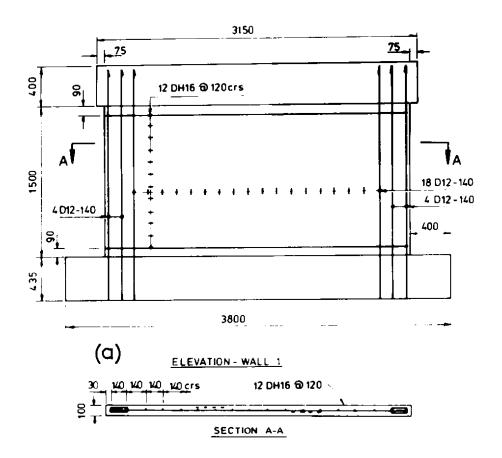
Arrangement of reinforcement of specimen Wall 1 (Paulay et al. 1982)
